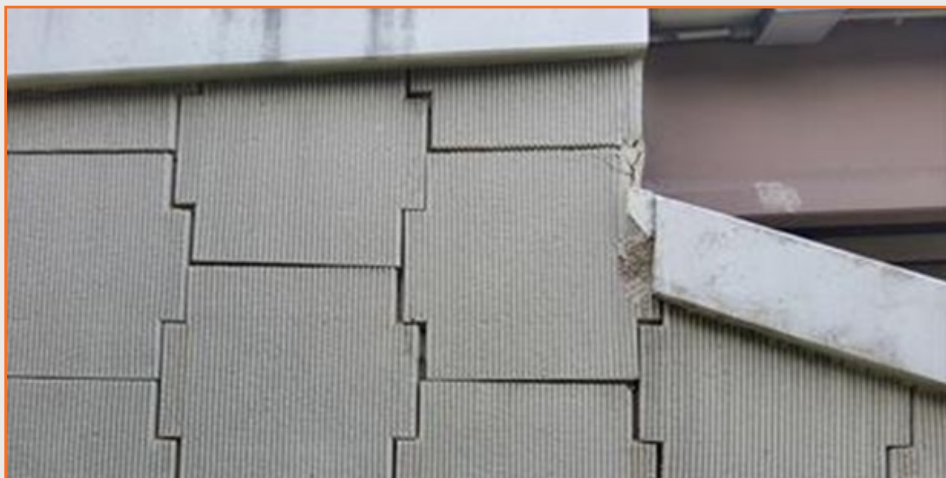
DNT MSE racked wall panels exhibiting cracking and spalling NBML south of IH-635.
